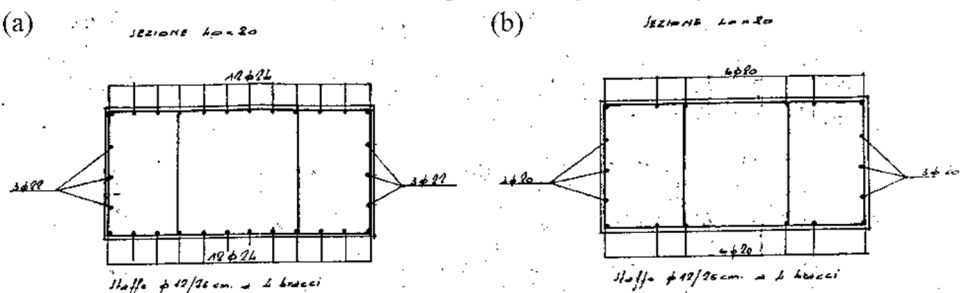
Primary columns typologies at the ground and first floors: (a) C-P2 cross section, and (b) C-P3 cross section (adapted from original drawings)
